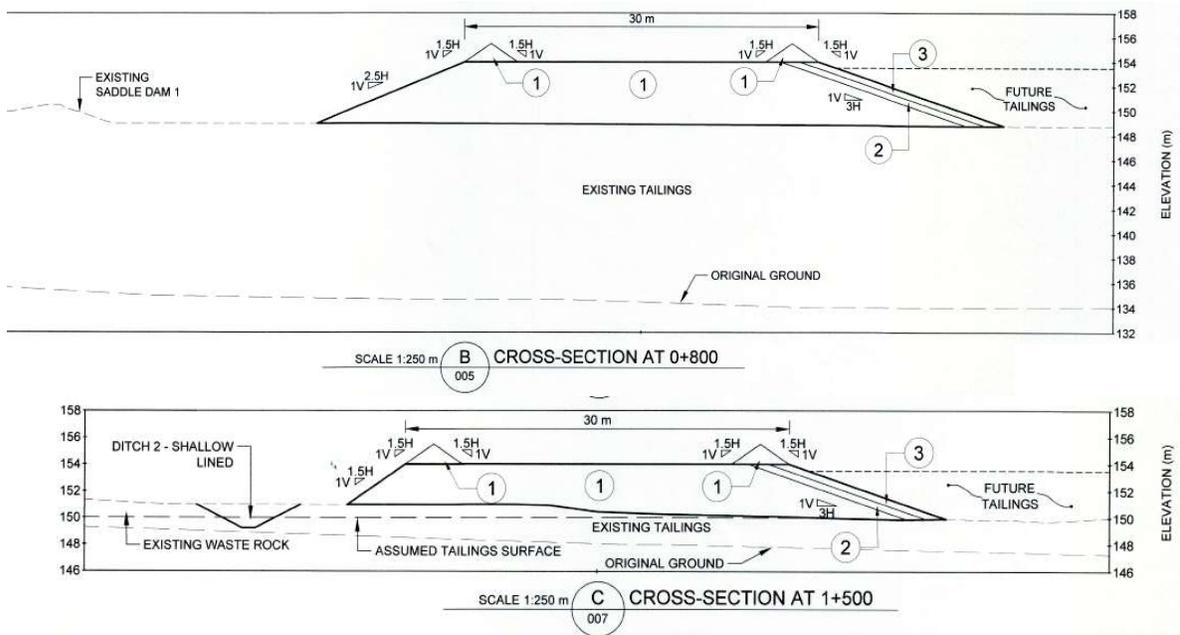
Typical Cross-section of the North Cell Internal Structure
